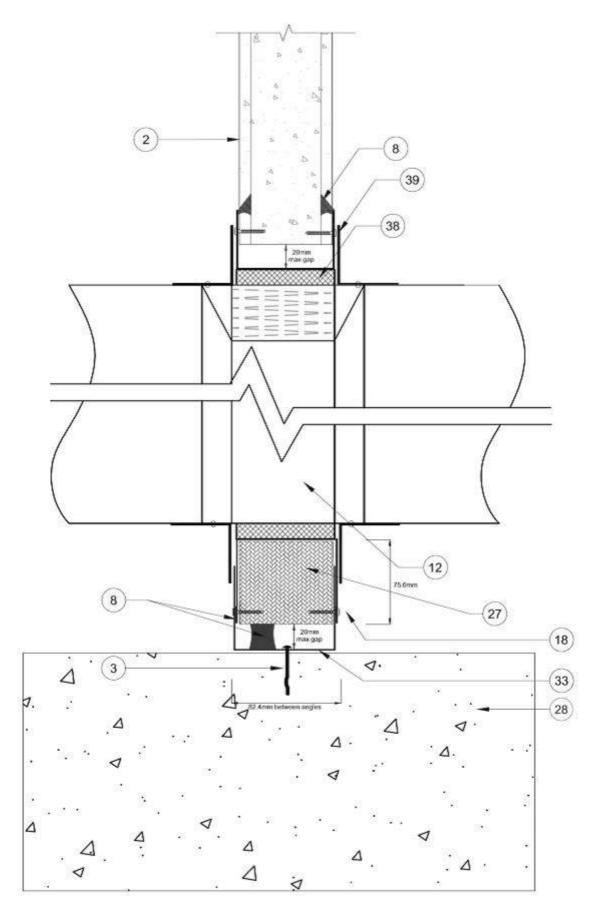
Holyoake IBD-FS and IBD Damper installation 75mm-95mm from base of wall
